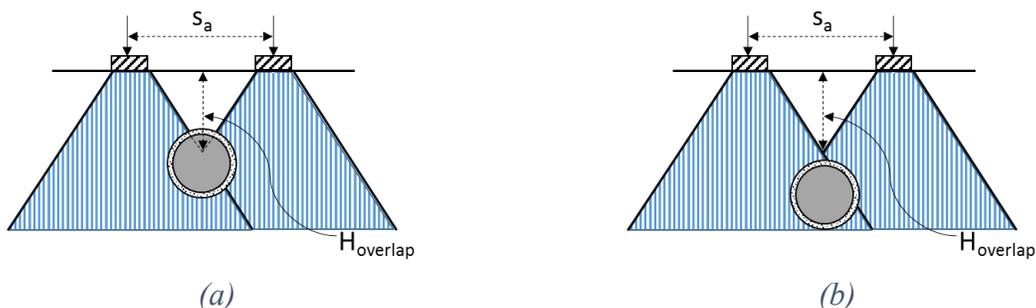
Load Distribution for the Direction Parallel to the Pipe Span.
